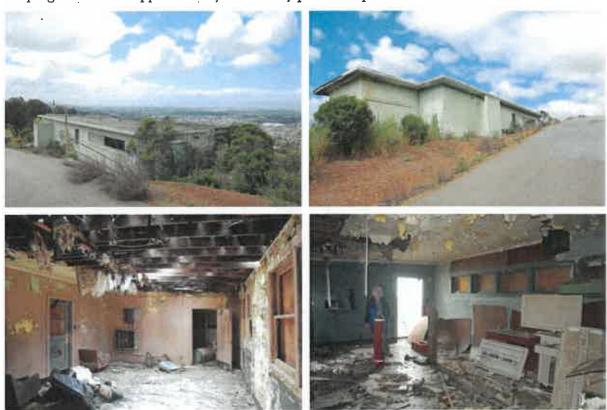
Quarters Building. Upper left: north and east façades, looking south. Upper right: south and east façades, looking north. Lower left: Interior of southern room. Lower right: interior of northern room.
